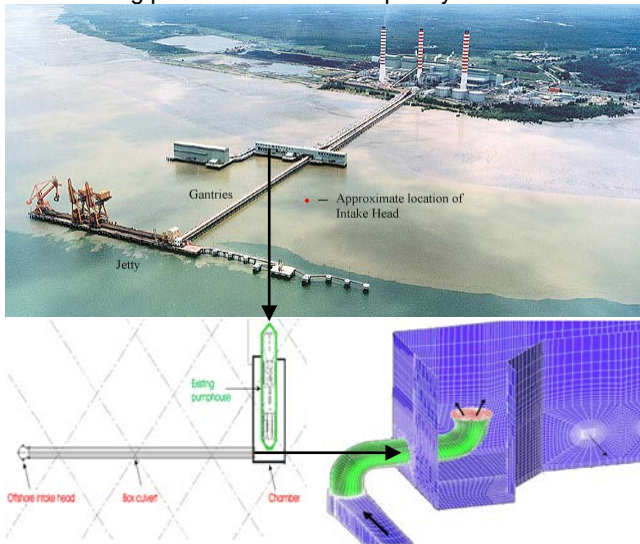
Top: View of Kapar Power Plant. Bottom Left: Chamber and Pumphouse and Culvert to New Intake. Bottom Right: 3D Model of Chamber and Culvert Outlet
